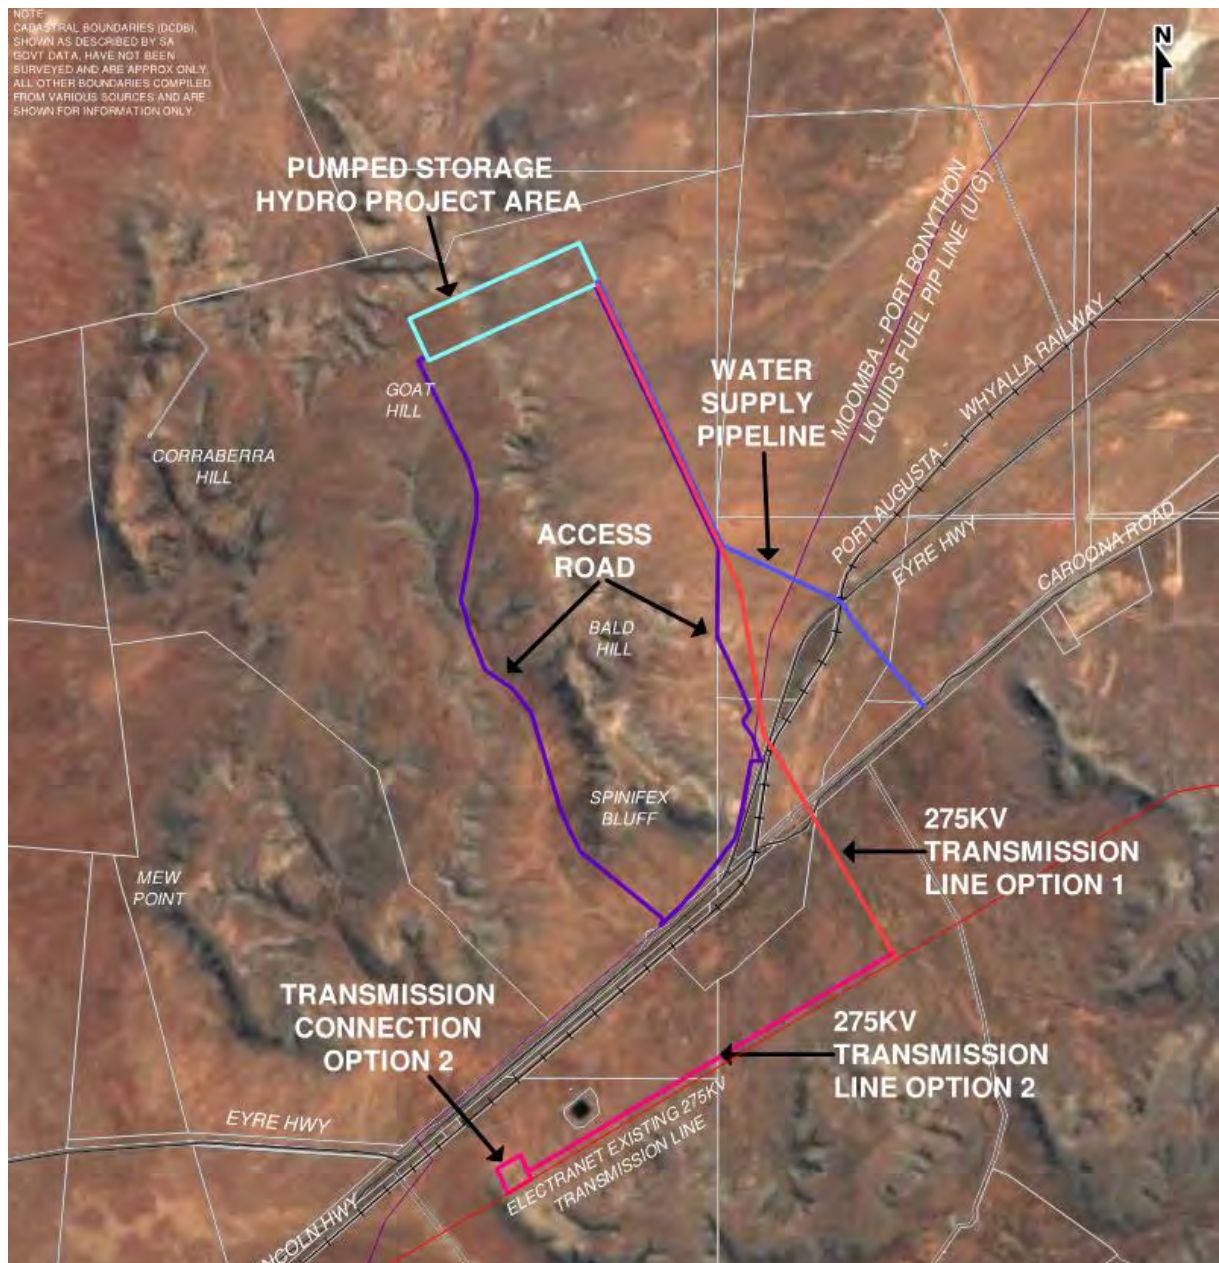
Proposed site layout (Source: Goat Hill Project Overview, GHL-LAC-DRA-0003)
